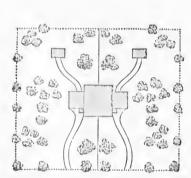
BLOCK PLAN OF SCHOOL GROUNDS. - No. 3.
